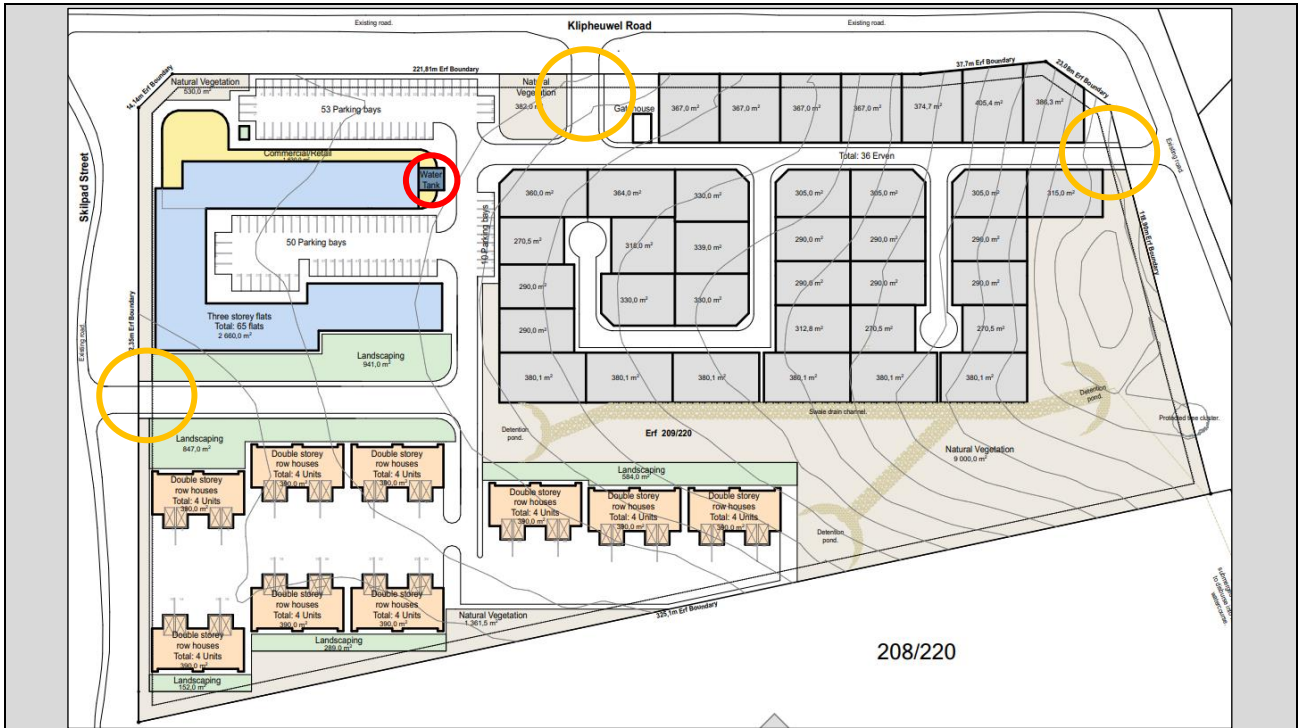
Mitigated Preferred Site Development Plan (source: Hamilton Wessels Architects).
